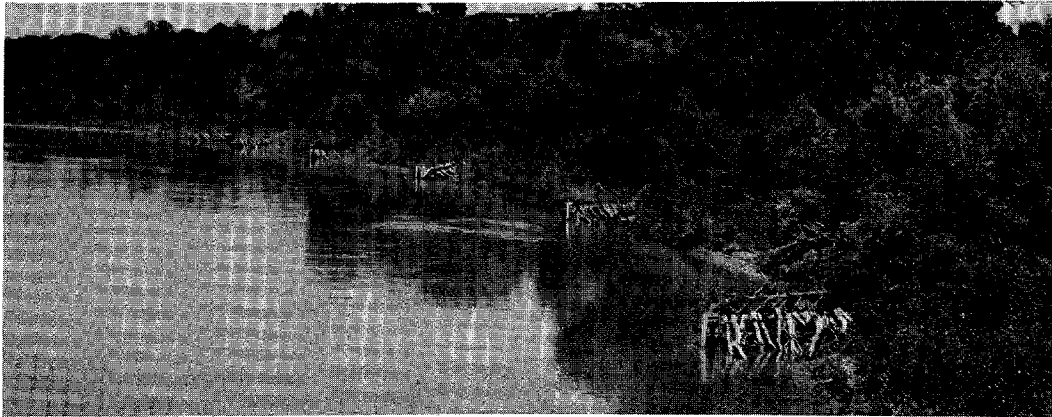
Upstream view, in 1977, of spurs at left bank upstream from bridge.
